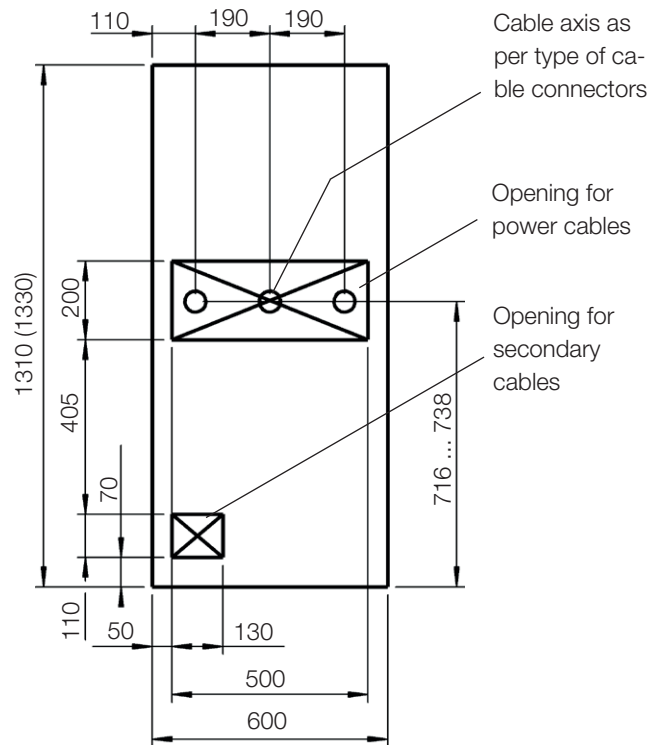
Floor openings for power cables and secondary cables, panel with switch disconnector and fuses
